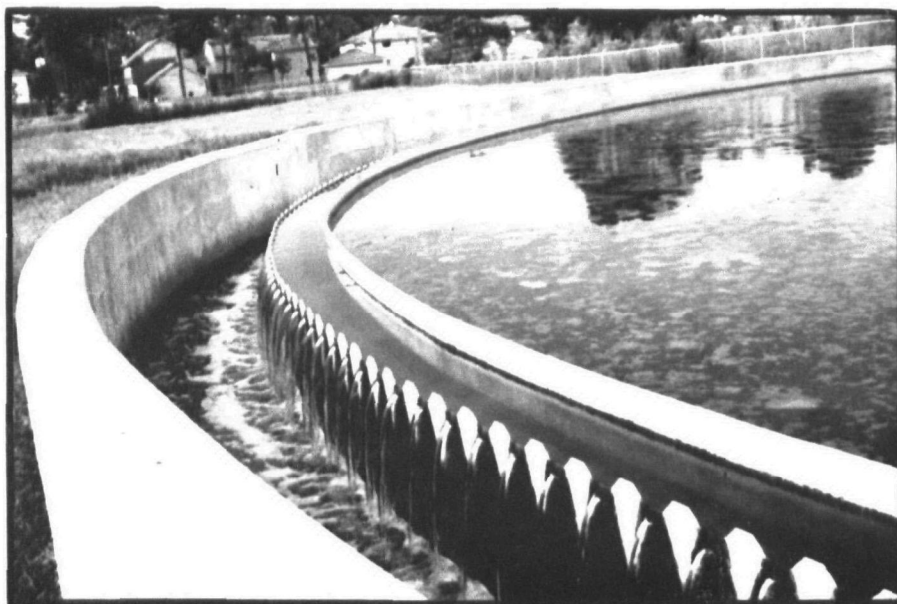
PLANT DETAILS FOR EXISTING NORTHWEST TREATMENT PLANT
